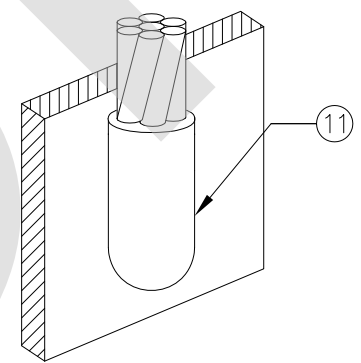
H – VERTICAL WIRE TAP TO A VERTICAL STEEL SURFACE.
